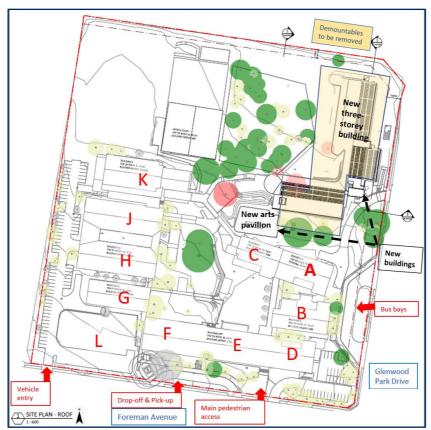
| Site layout (Base source: Applicant's EIS, 2021)
